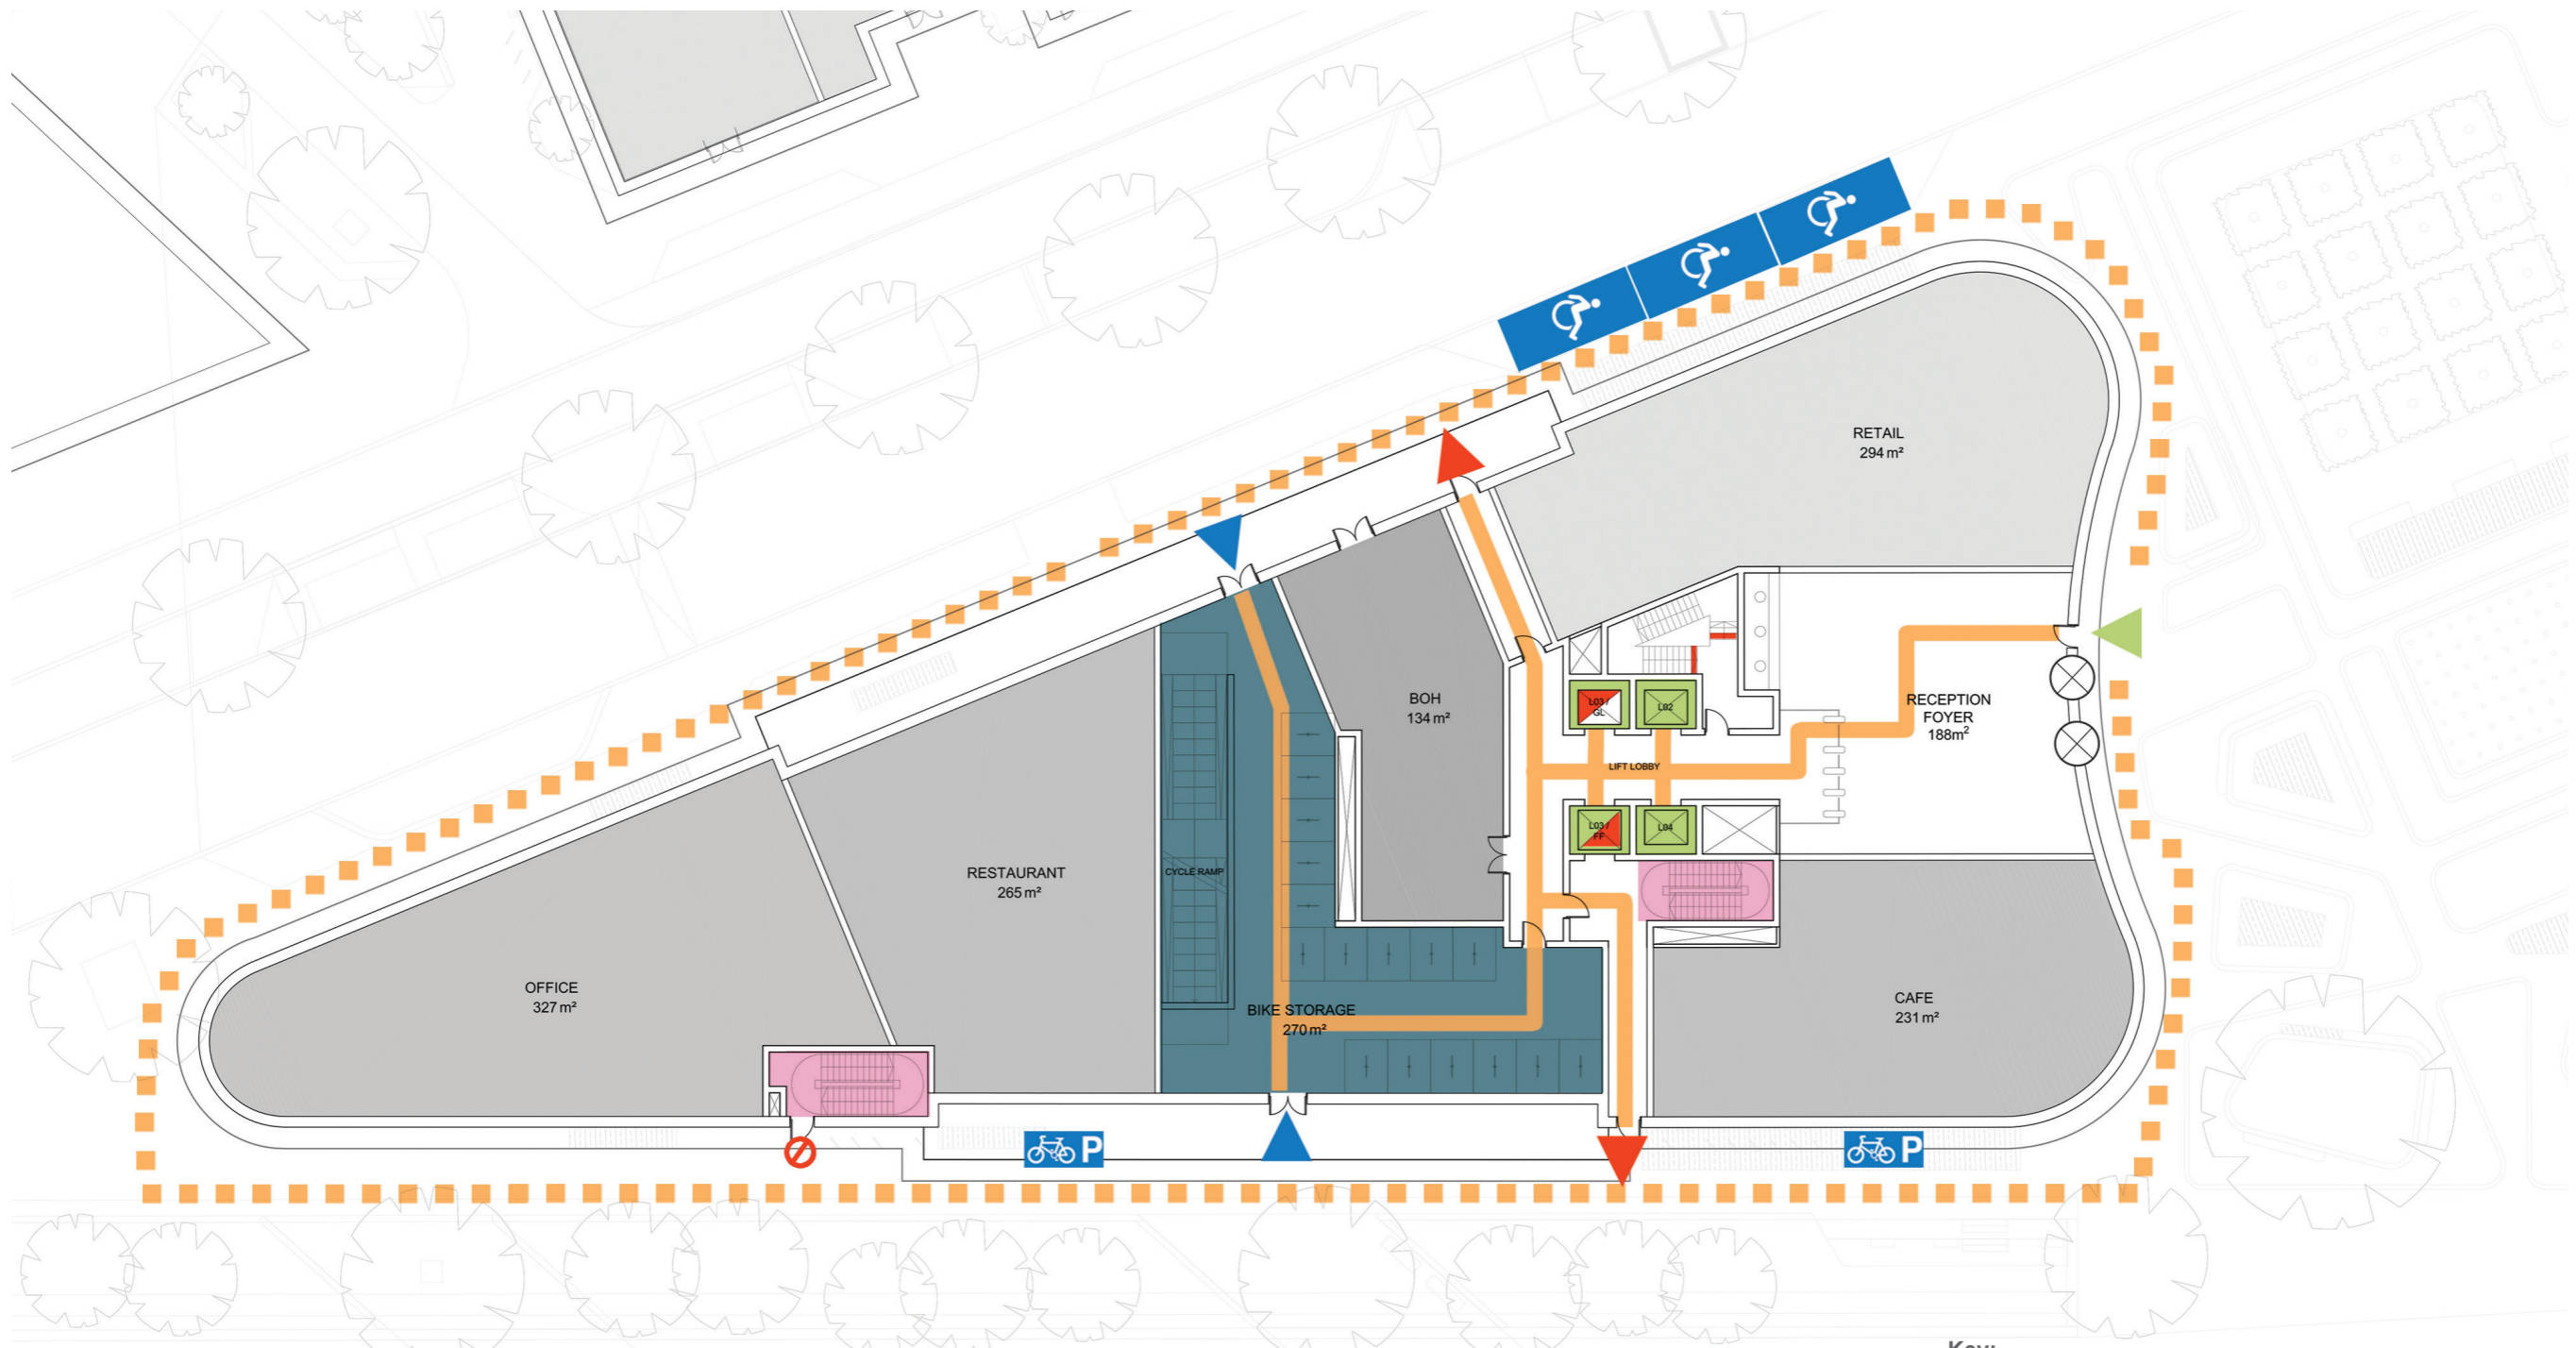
Triangle Site - One Chesterton Square (S9) Typical floor I access overlay.
